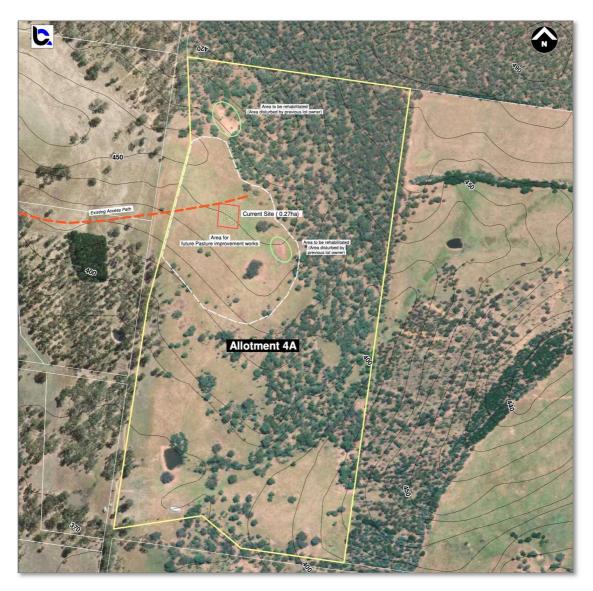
Excerpt of 'Site Photo Plan' by BCA Consulting, showing the pasture improvement area within the Subject Land, and the truck access route.
